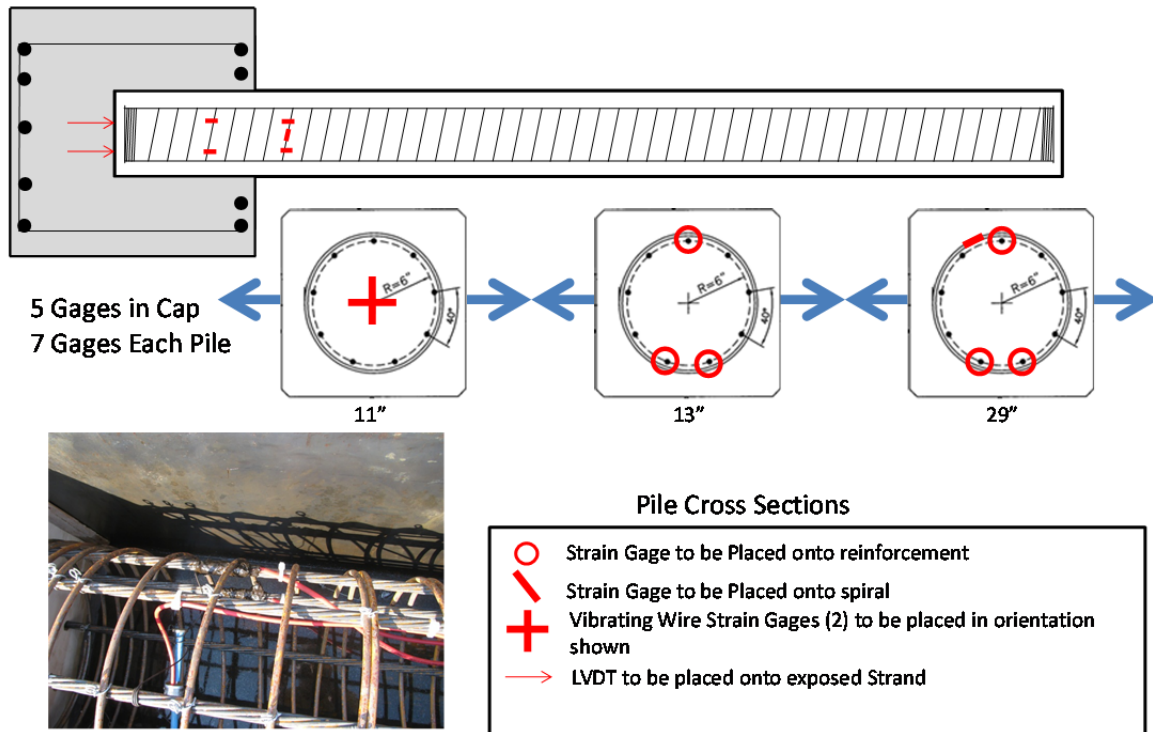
Pile Instrumentation - Specimens IB-22-1 and EB-22-1
